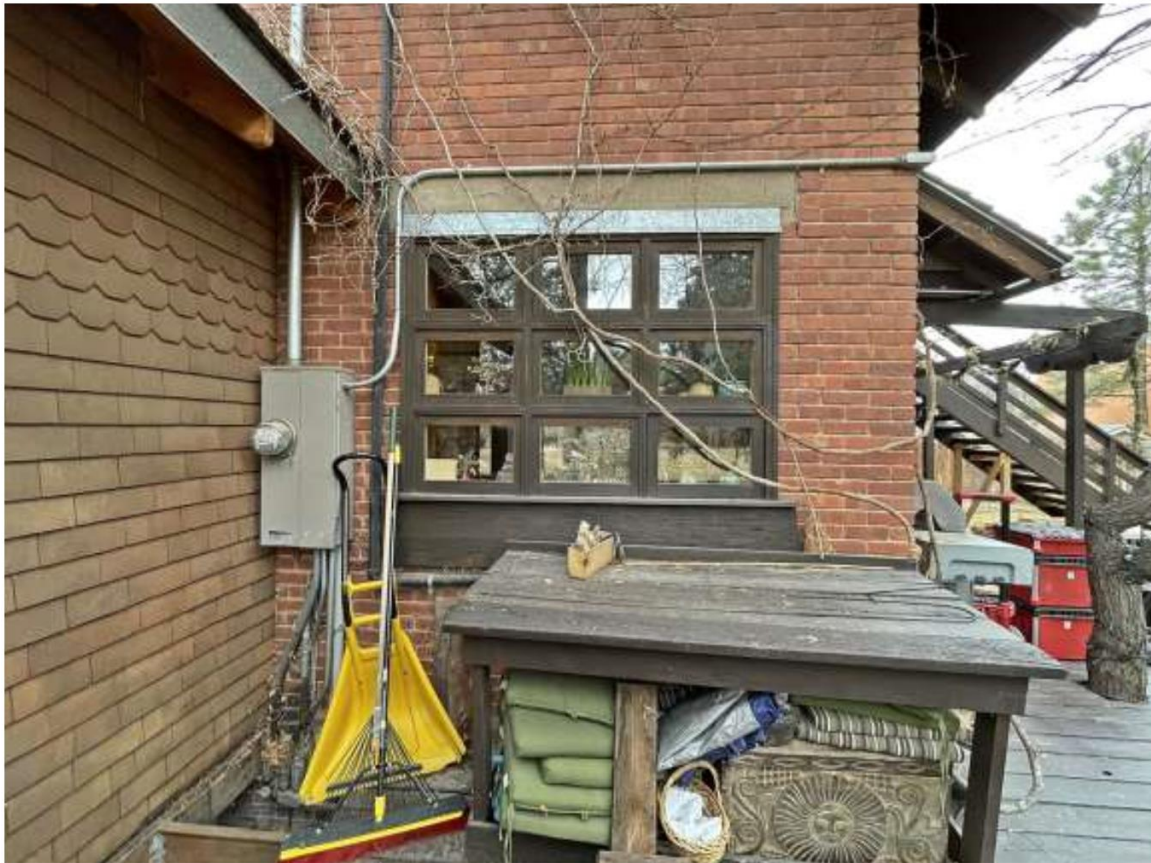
East elevation, 1970s addition (right), non-original window at kitchen (center). Camera facing west.
